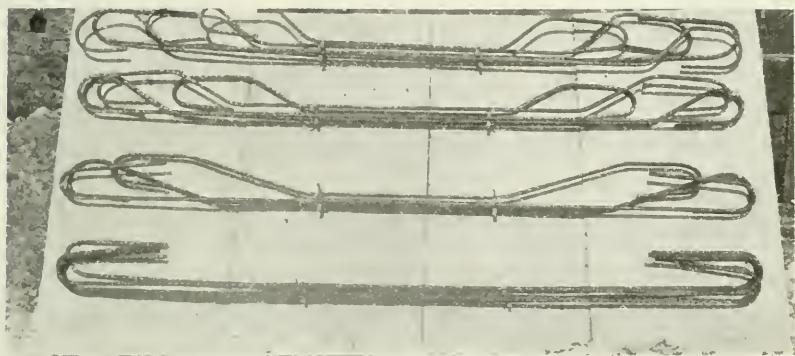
View of Fabricated Reinforcing Units for Gypsum Beams
